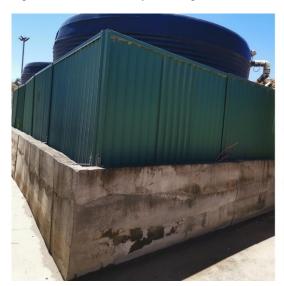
Bunded Tanks for Storing Runoff from Timber Waste Yard and Landfill Leachate
